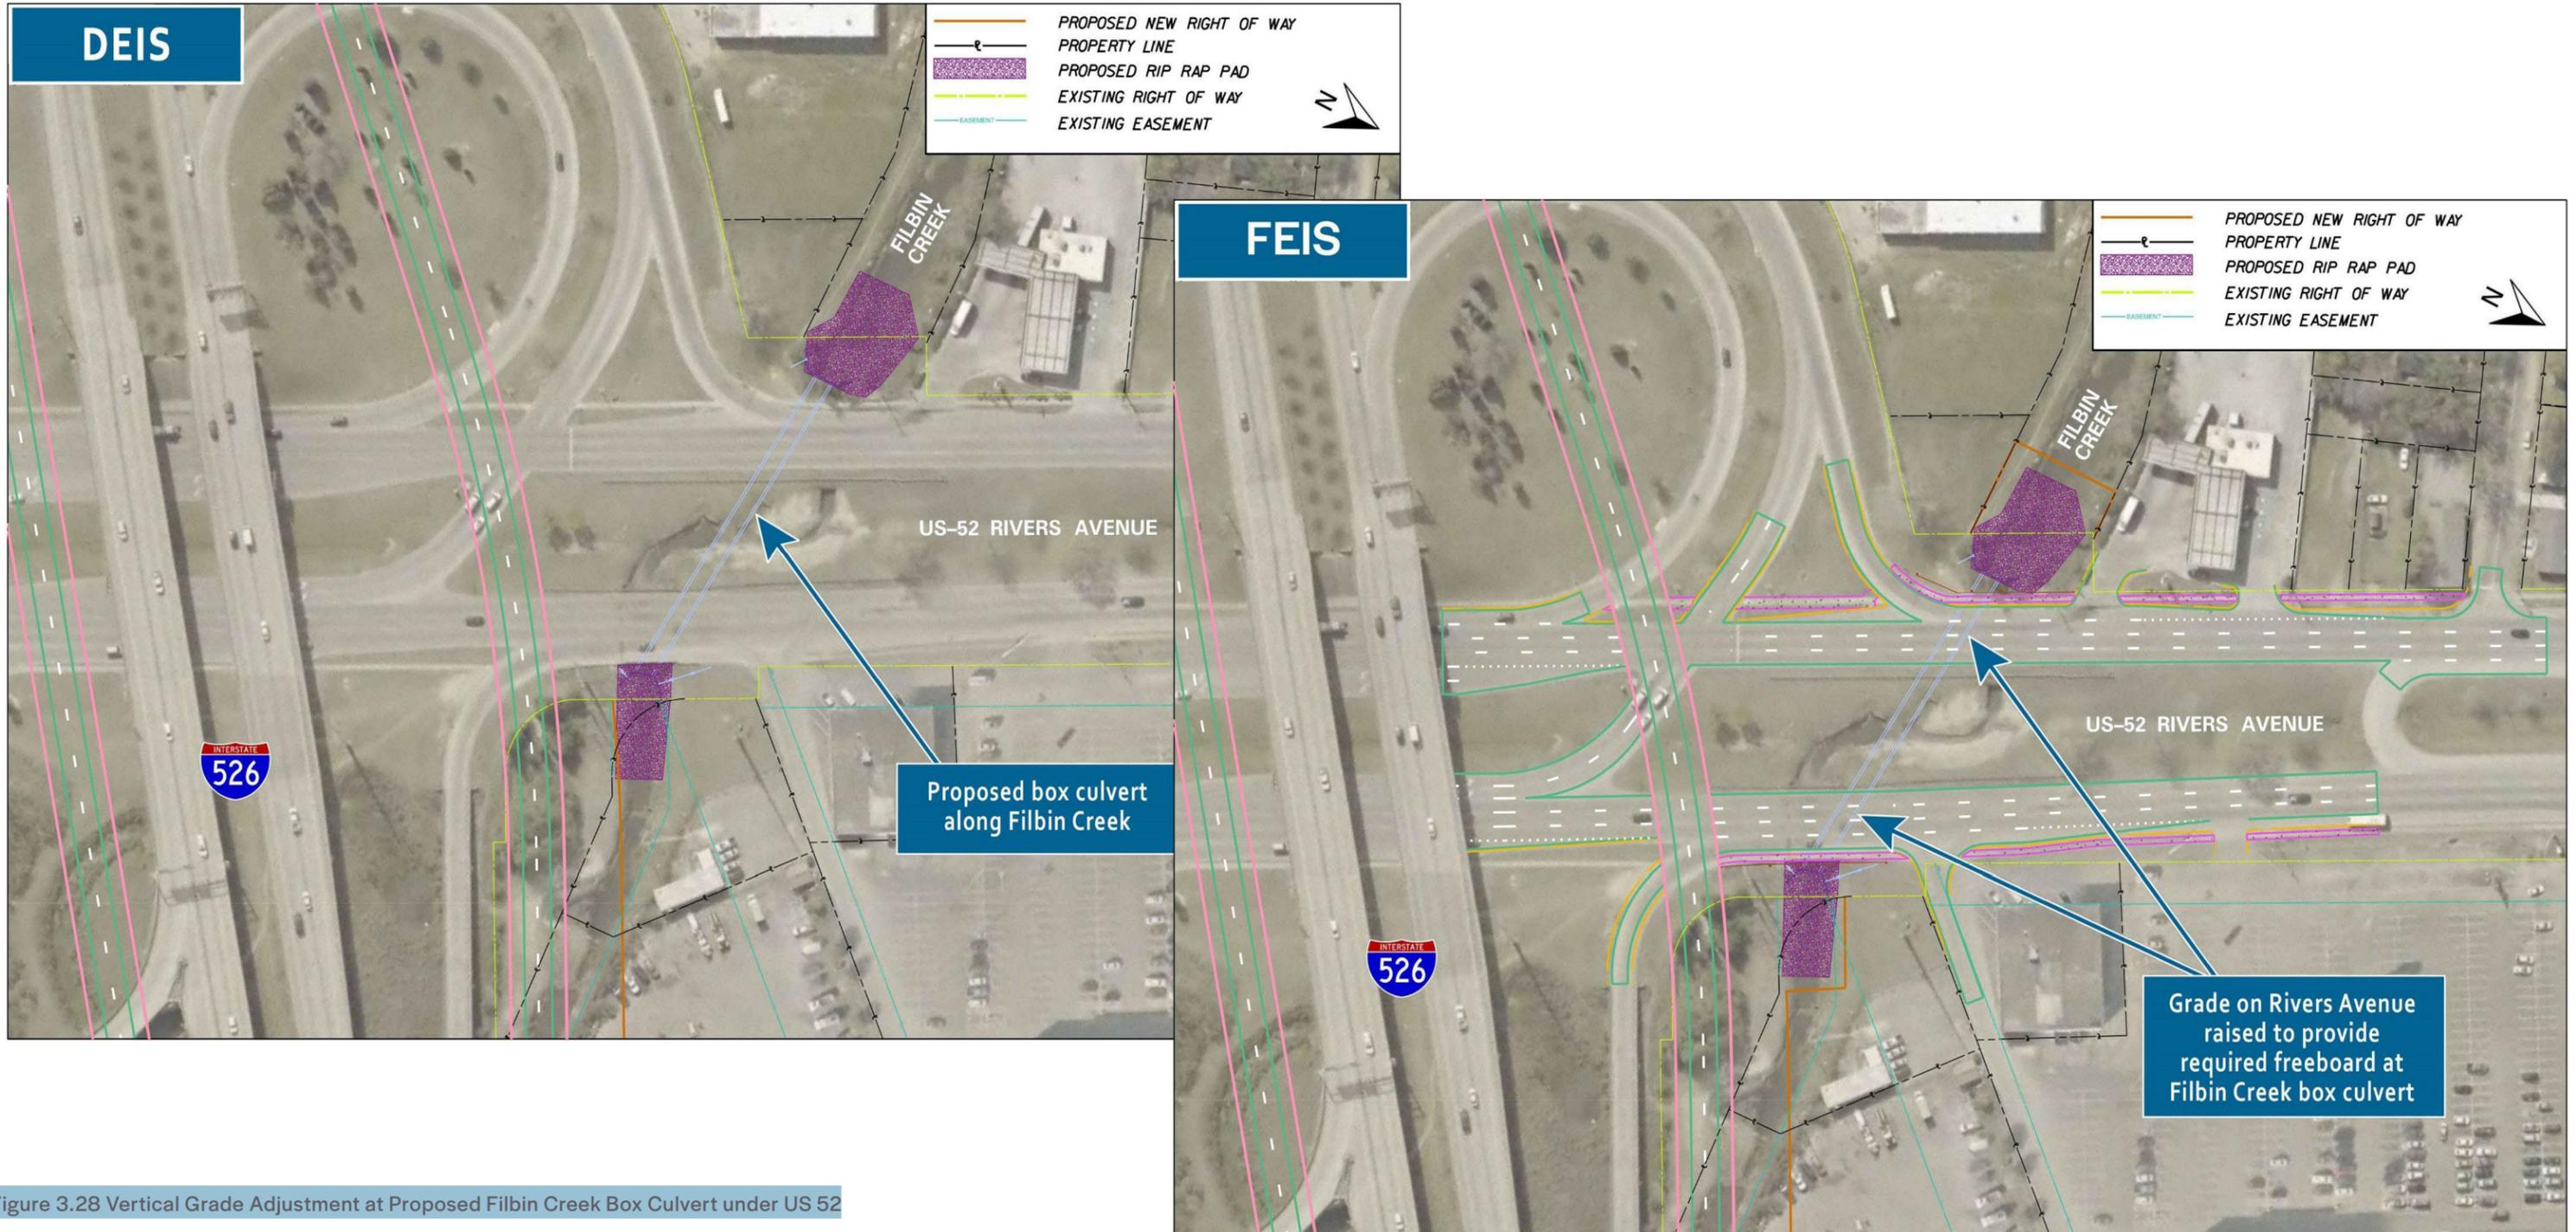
Vertical Grade Adjustment at Proposed Filbin Creek Box Culvert under US 52
